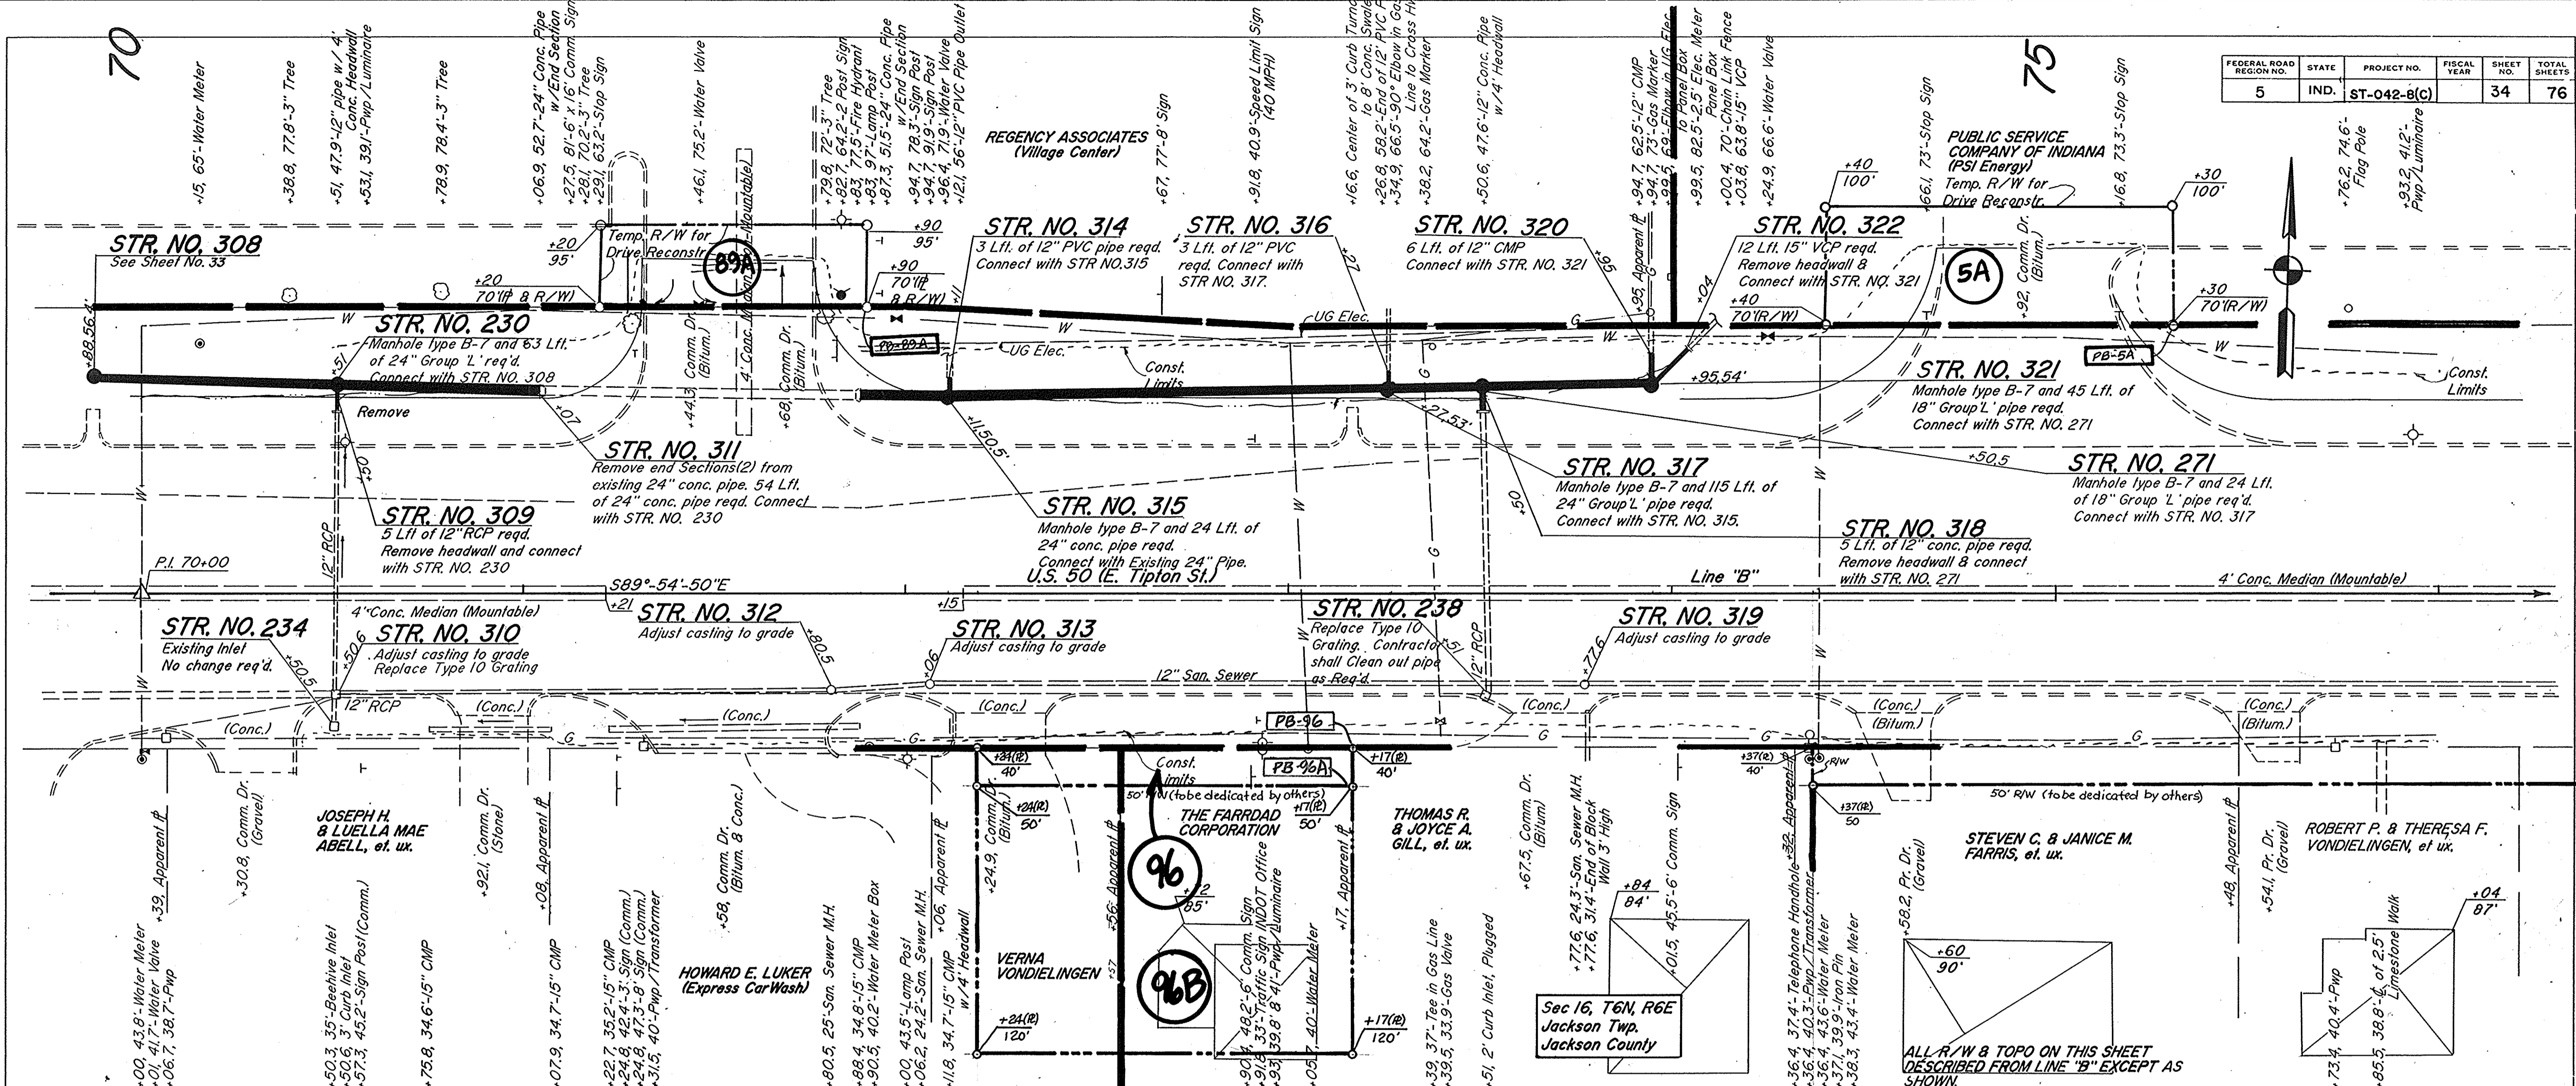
PLAN - PROFILE B & R STANDARD 1975
